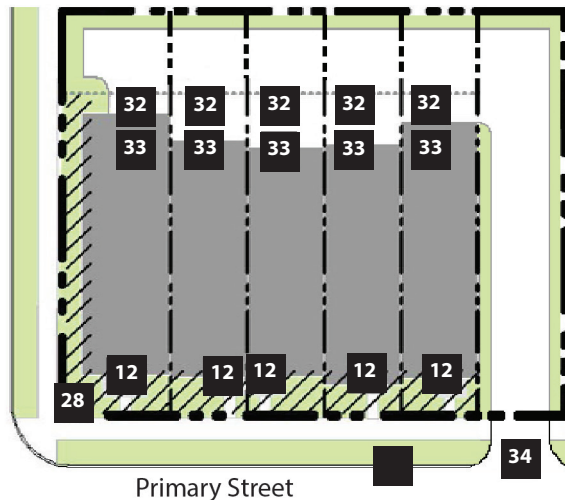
Row building siting diagram shown with attached garages and rear vehicular access. Not to scale.
